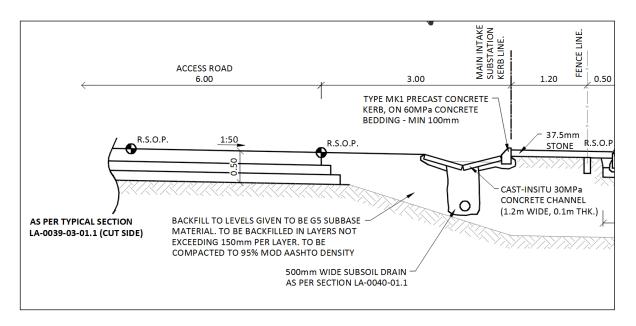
Typical Cast In-Situ Concrete Channel Detail
